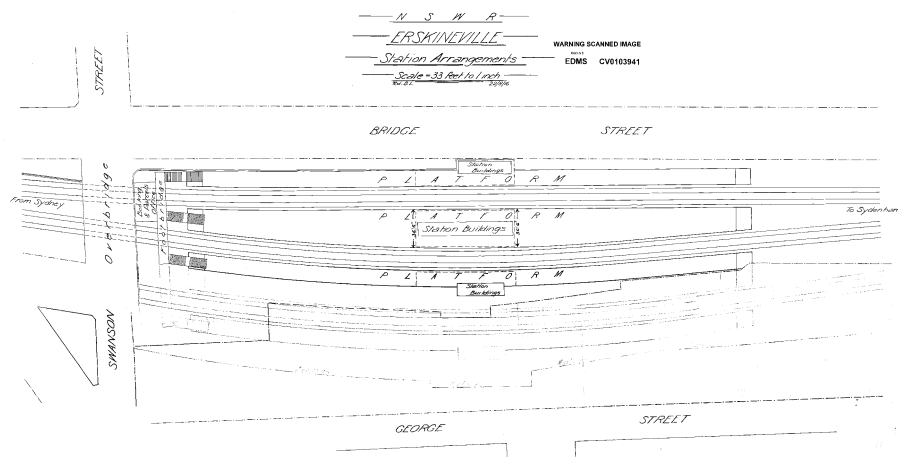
Station arrangement overview showing 1911 design (plan dated 1916)
